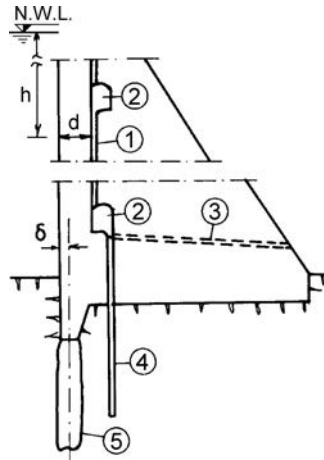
Drainage of the dam's body and foundation. (1) Drainage of dam; (2) gallery; (3) outlet opening; (4) drainage into foundation; (5) grout curtain.
